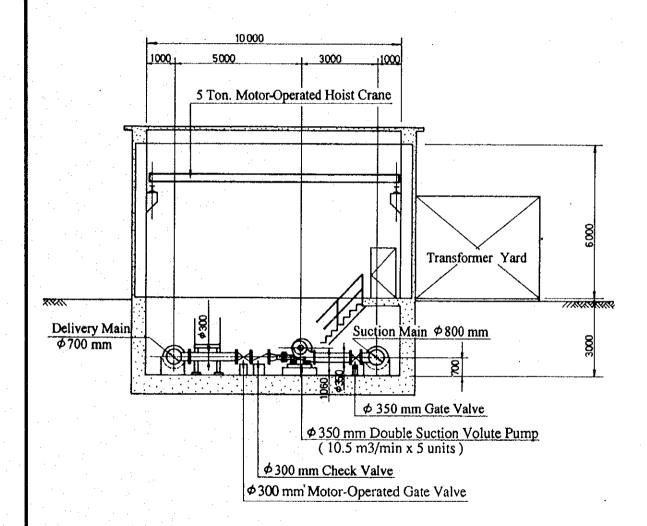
Typical Layout of Transmission/Booster Pump Station - Elevation < Distribución Típica de la Planta Elevadora de Impulsión/Conducción - Elevación >
